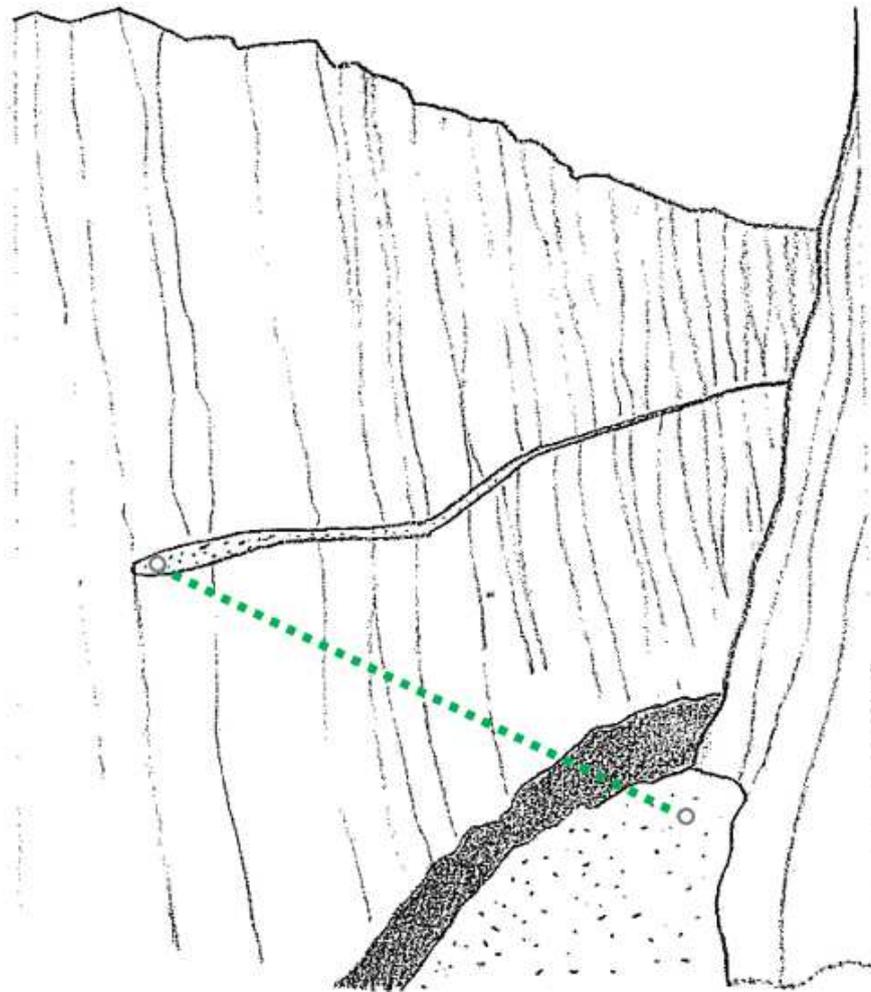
Sketch of the canyon location at which the trail dead ends will have to be connected by the crossing (dotted green line).
